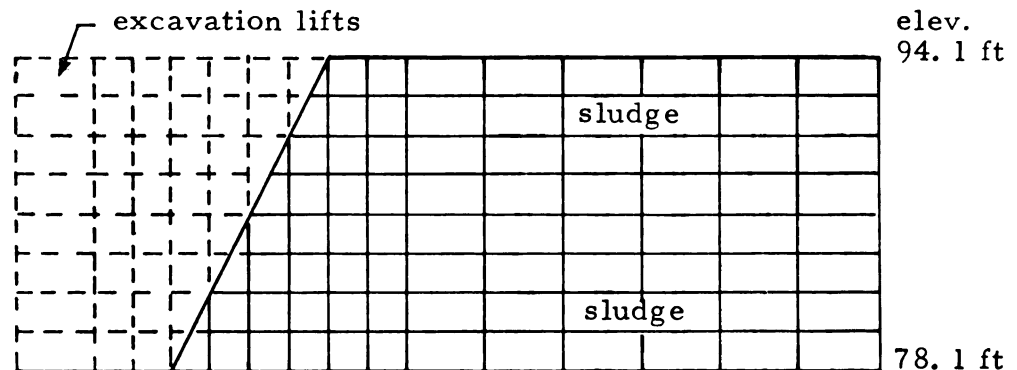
(a) Excavated slope showing the section to be analyzed.
